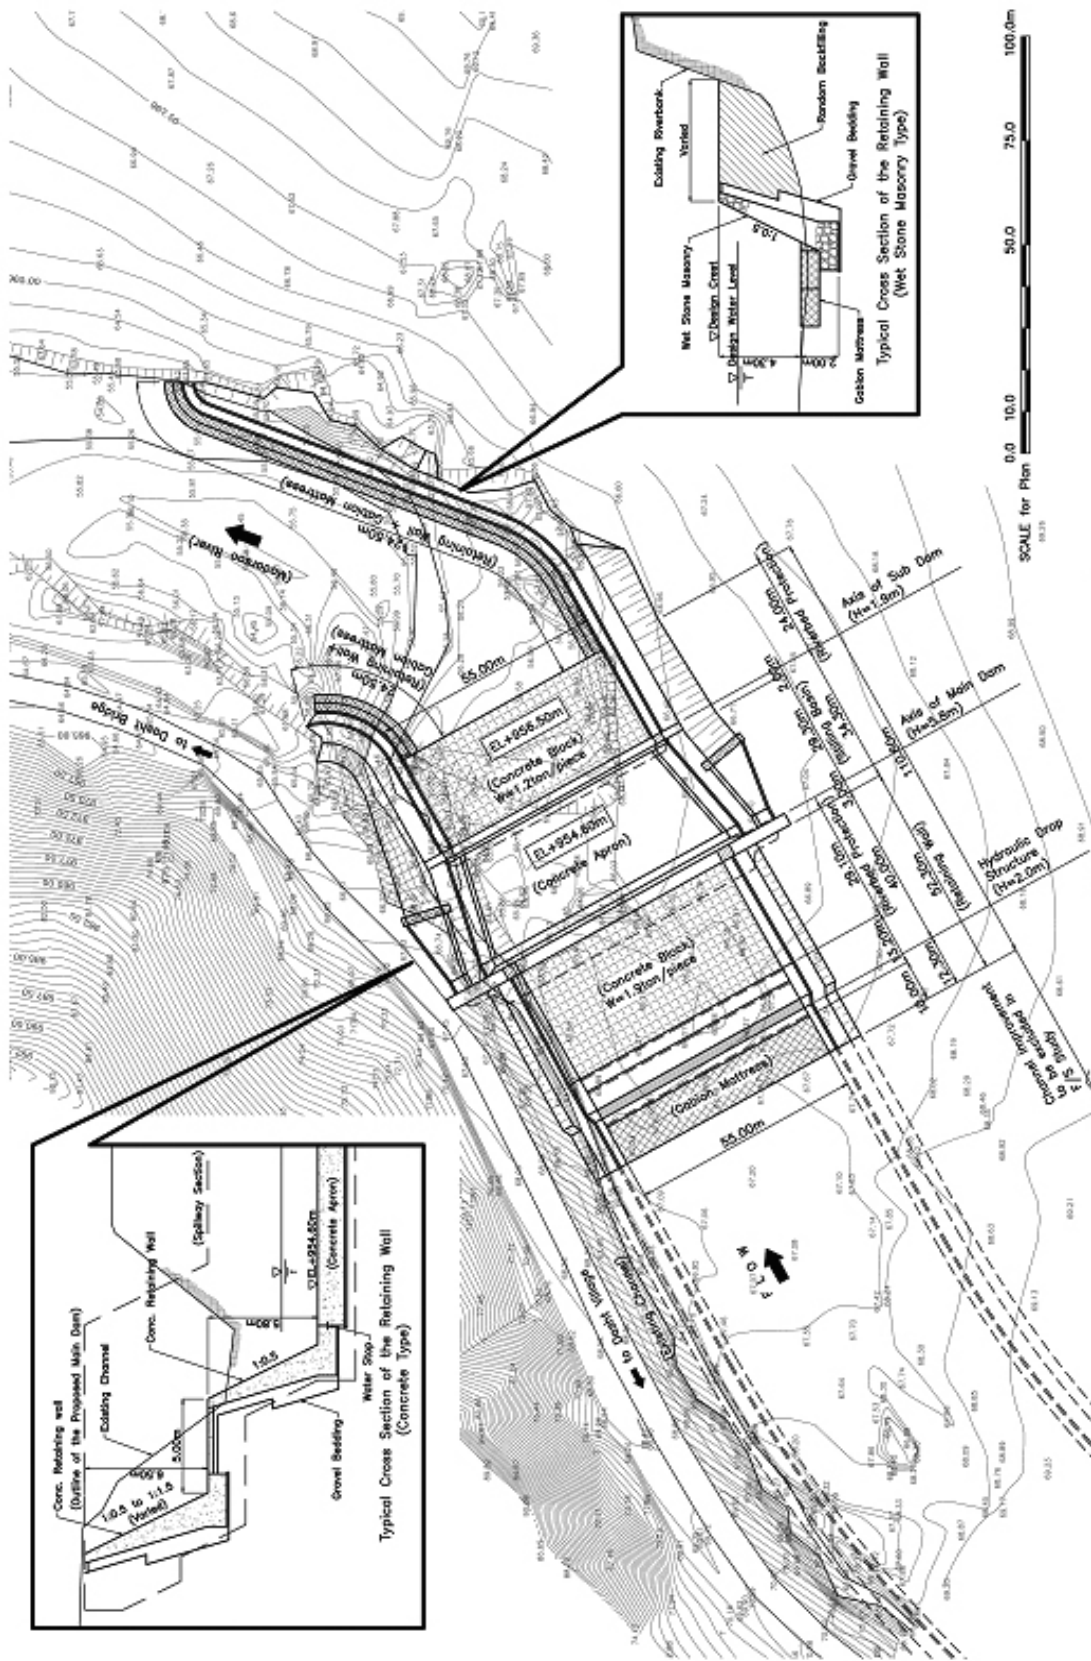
Plan of Proposed Riverbank Stabilization Works
